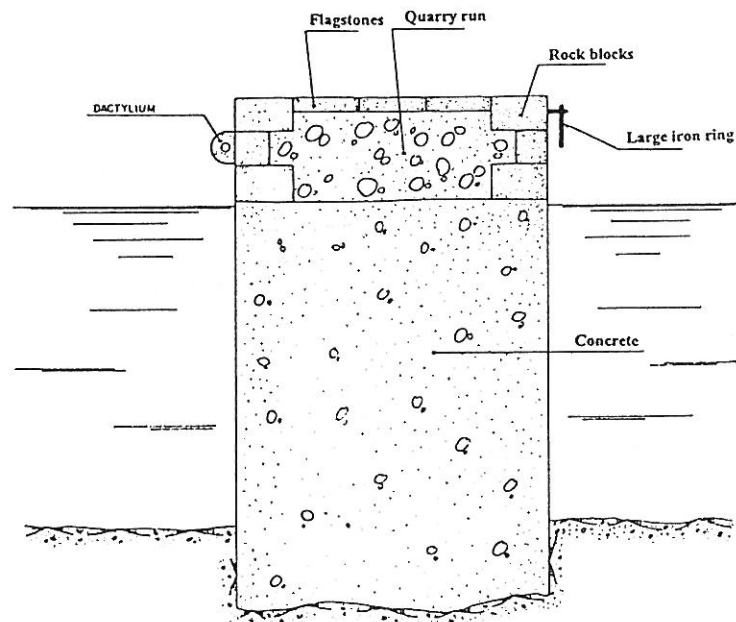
Cross-section of massive concrete vertical breakwater (de la Peña, Prada & Redondo '95, according to Vitruvius (5-13))
